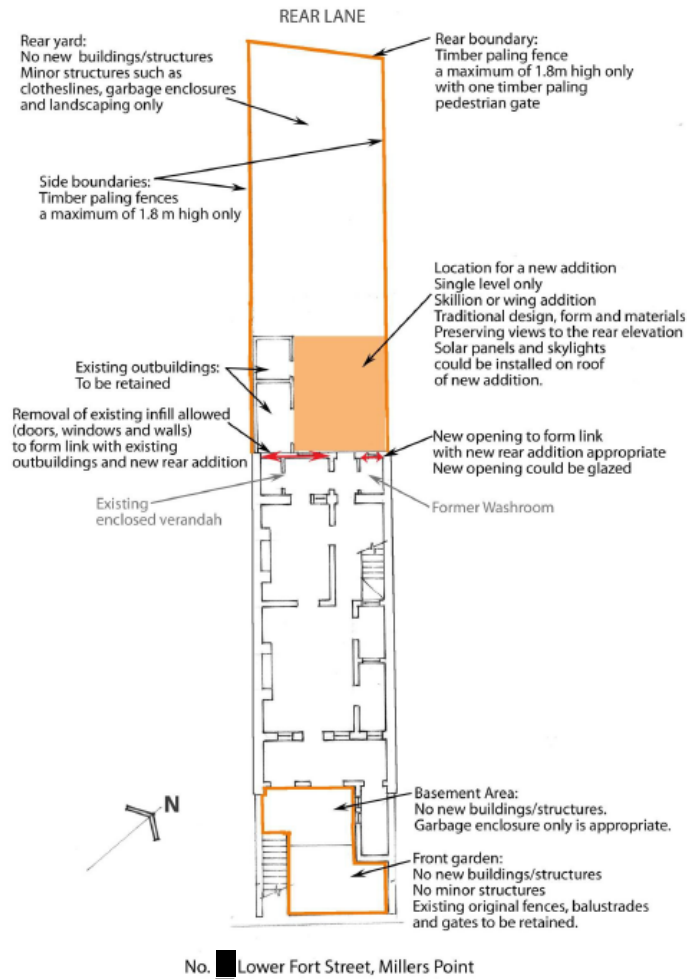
Site plan for [redacted] a property in Lower Fort Street showing possible locations for new additions and openings (Clive Lucas, Stapleton and Partners Pty Ltd, 2014; p.x)
